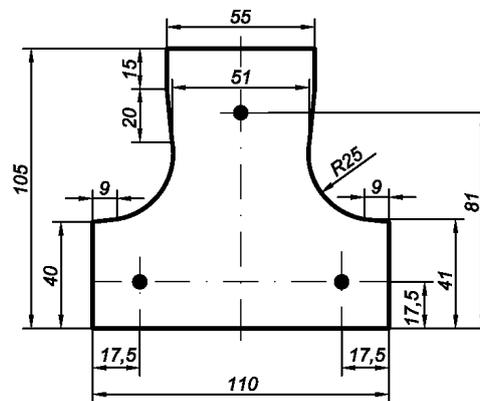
Dimensions of the tested joist and location of the reinforcing wires (mm).
